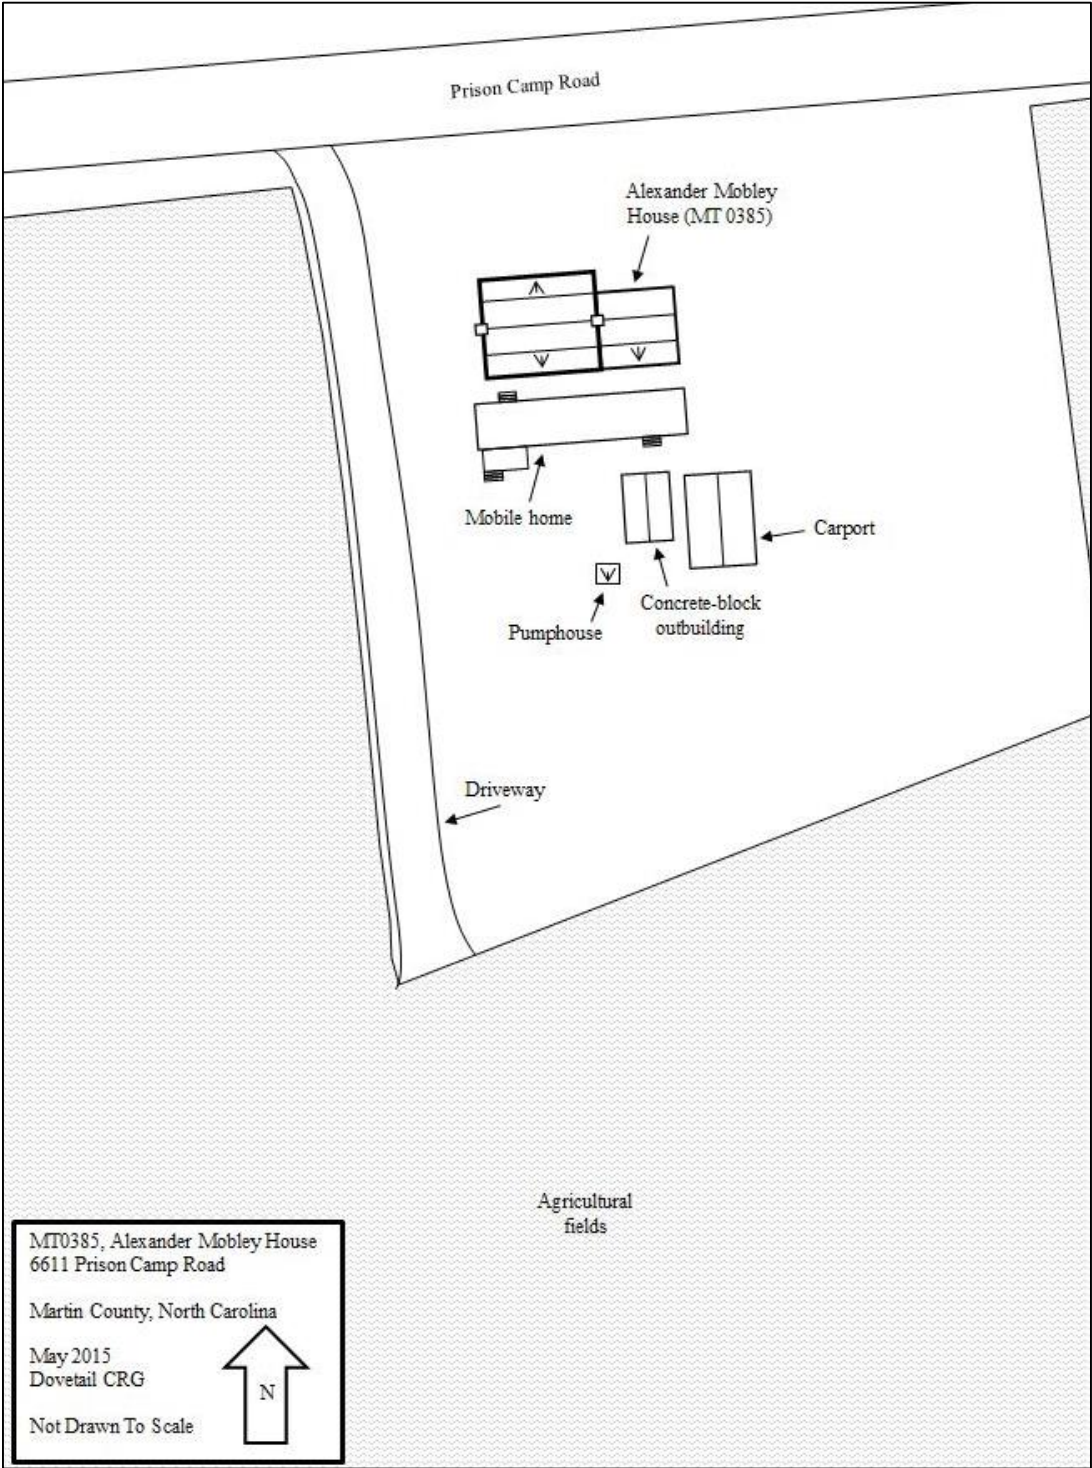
The Alexander Mobley House (MT0385) Site Plan.
